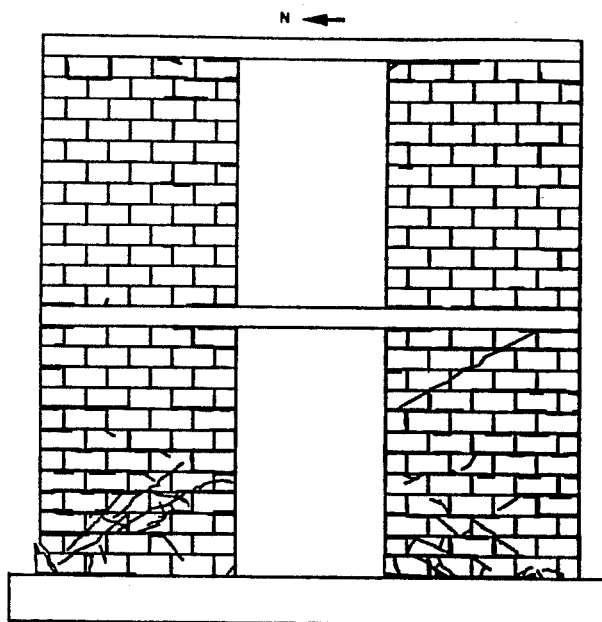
Sp. 2a: Progression of Wall Cracking at Load Point 213
